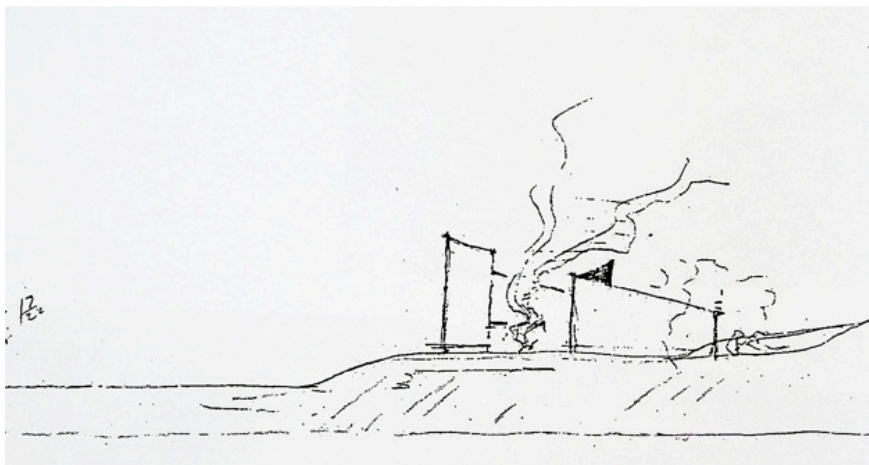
AALTO Muuratsalo House, site elevation sketch
